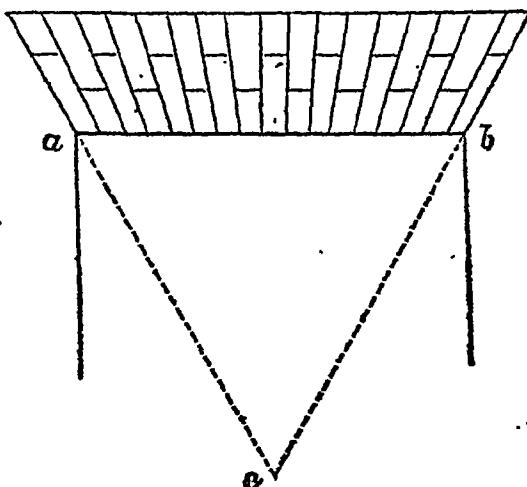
is the elevation of straight arch in brick-work, one and a half bricks thick, showing the method of construction.
